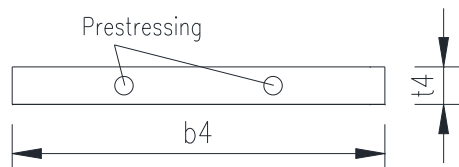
Prefabricated concrete slab with prestressed steel strands inside
